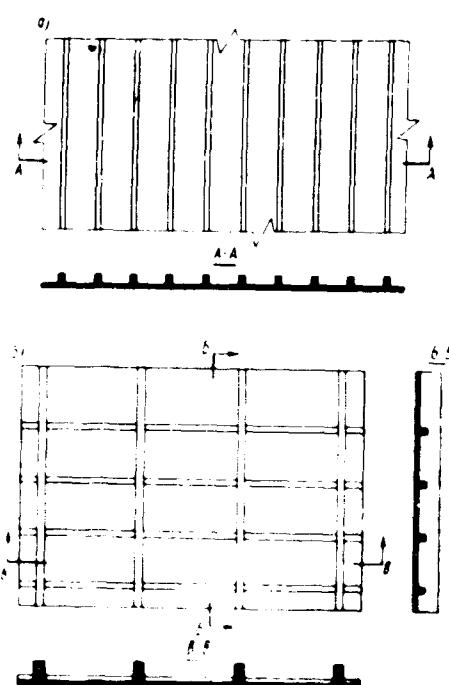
Reinforced concrete plates with ferroconcrete ribs:
